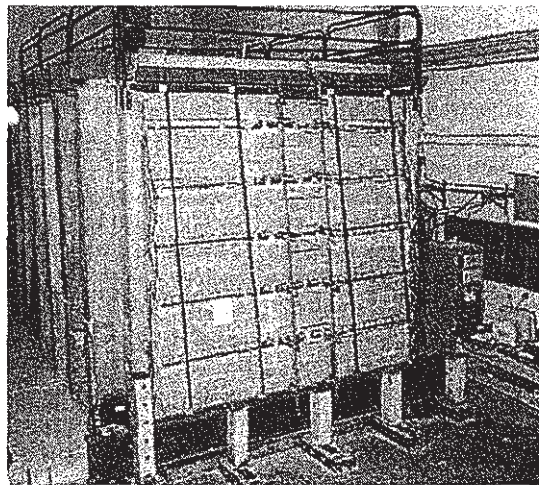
Reinforced soil segmental retaining wall (Wall 1).
